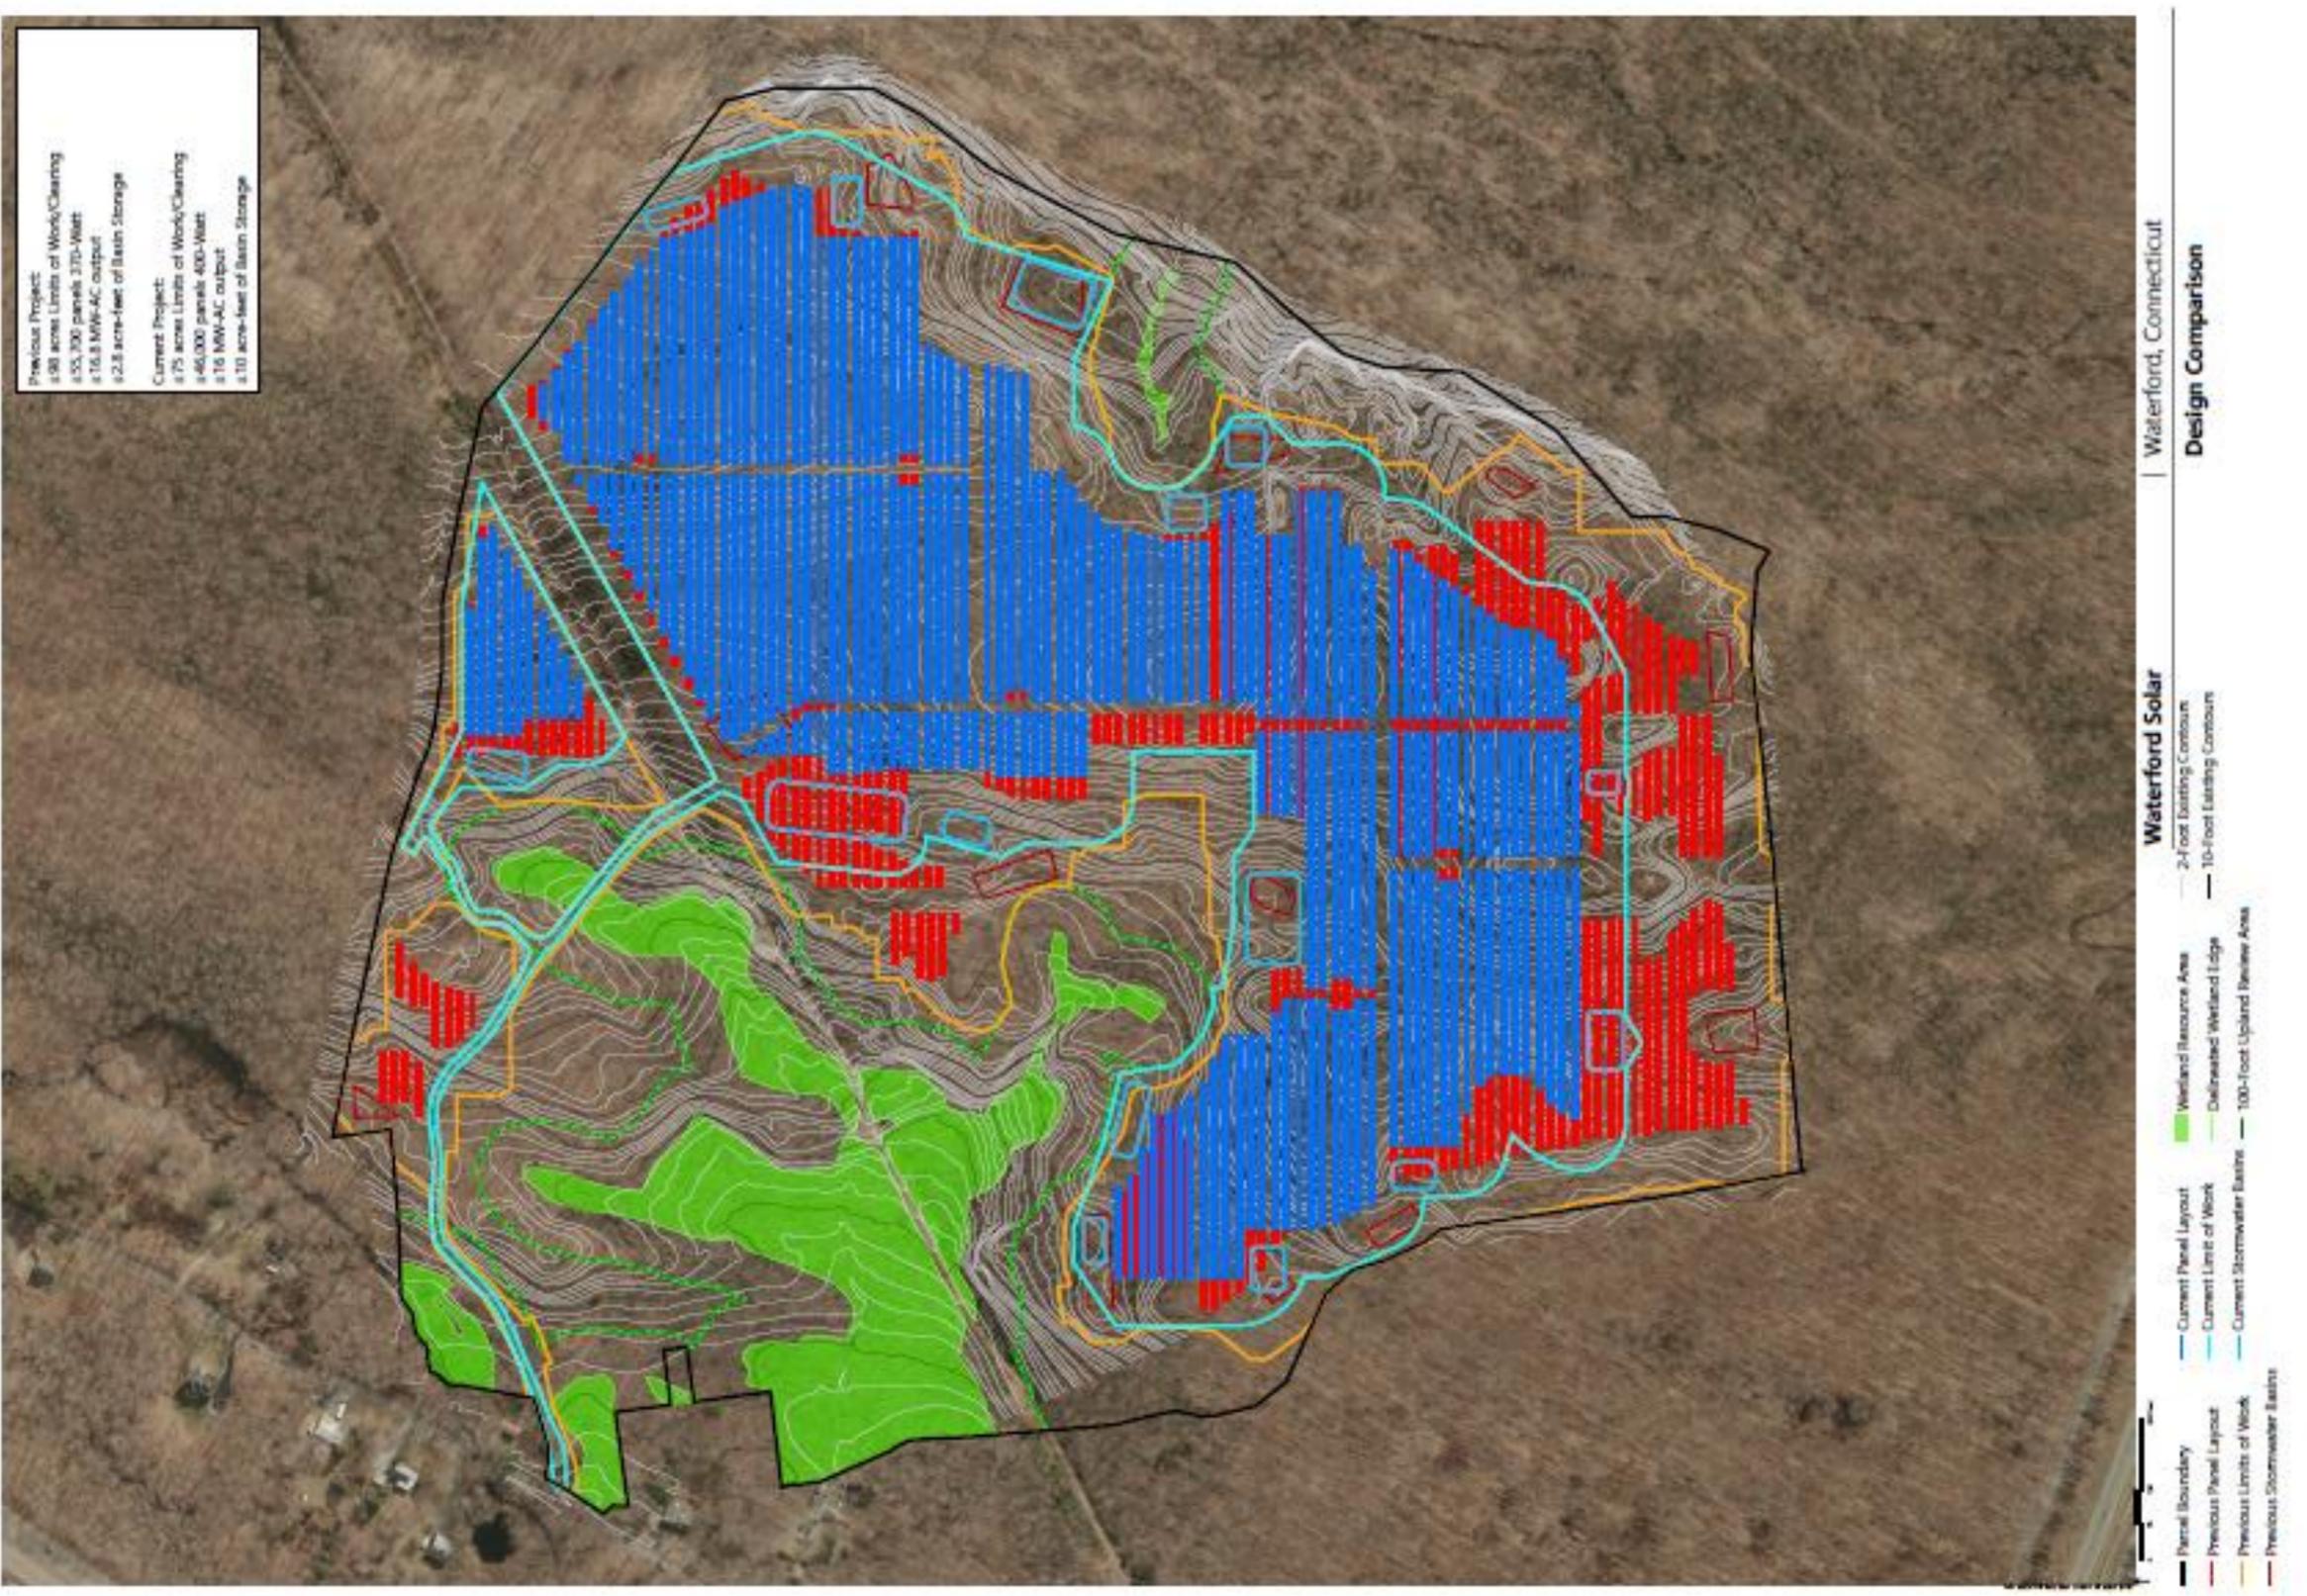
Plan view of the proposed project area in Waterford, Connecticut showing the locations of the proposed solar arrays, access roads and storm water management areas.
